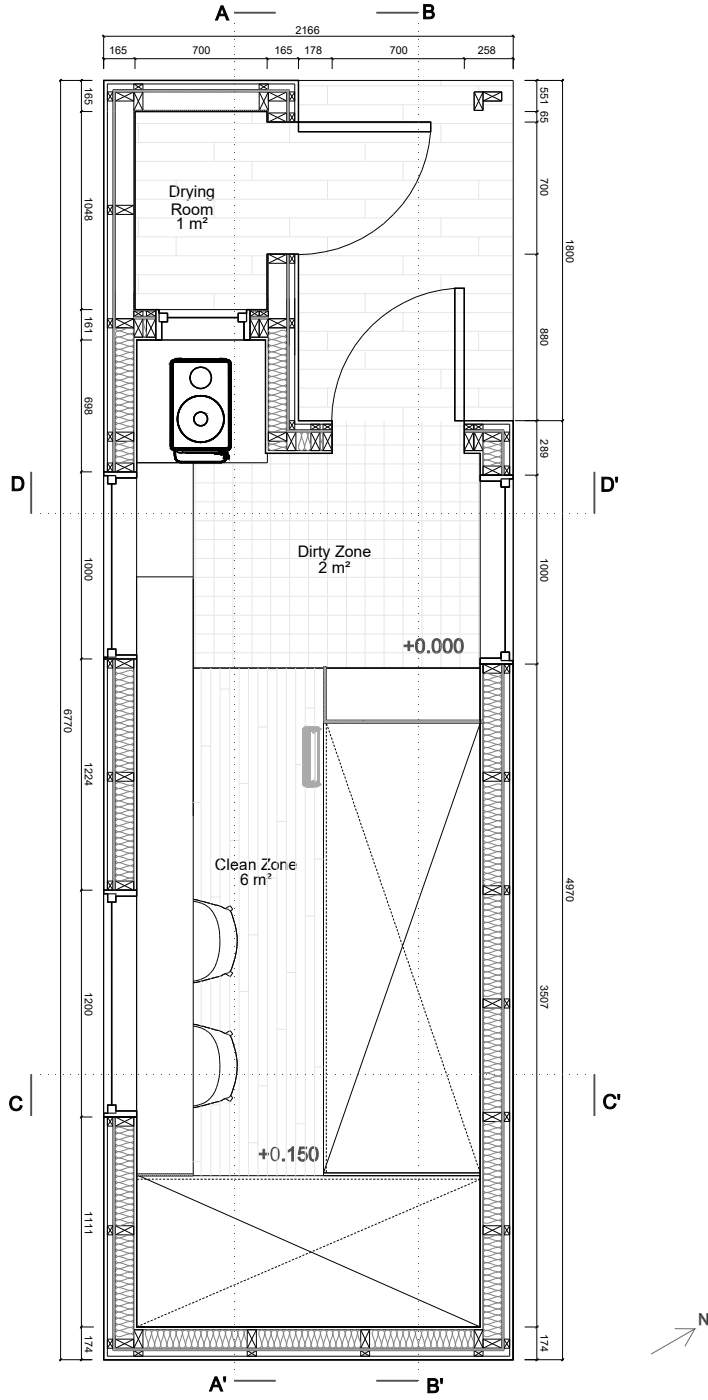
PLAN PRIOR TO THE BUILT. SCALE 1:40
